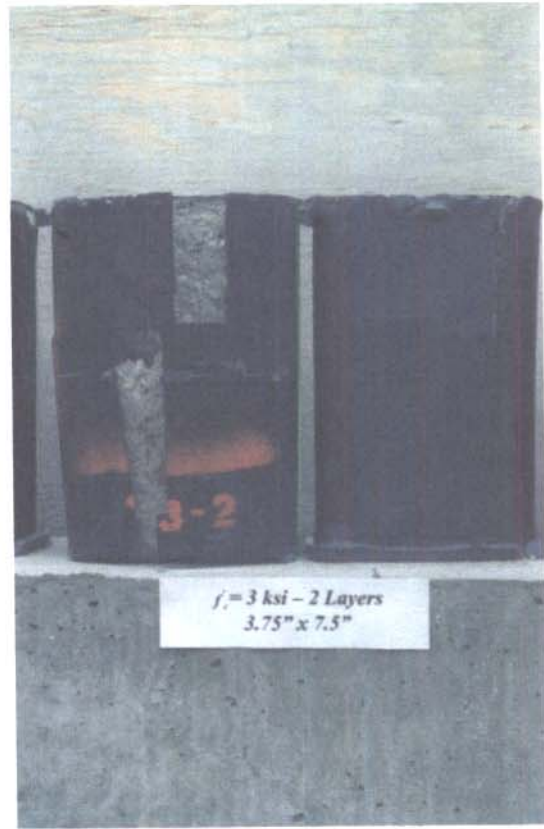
a) - Typical Failure of Specimens ($a/b=0.50$), Series 3: 3 ksi Concrete
